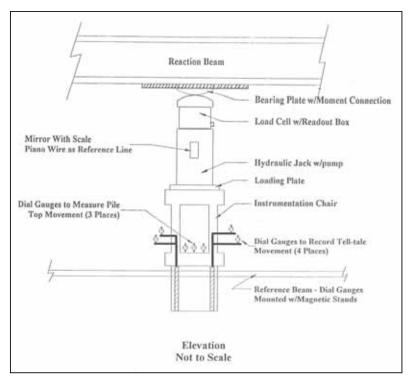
Typical static load test arrangement showing instrumentation.⁽⁵¹⁾
